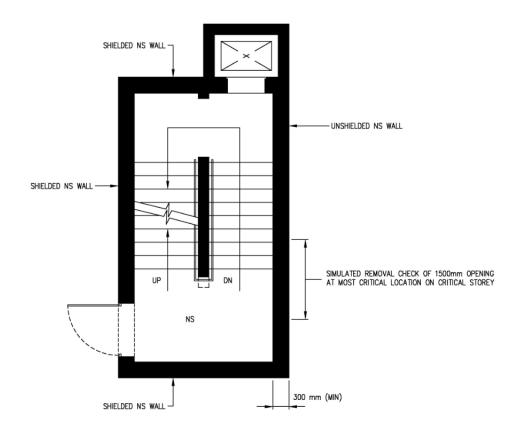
D : UNSHIELDED NS WALL OF S/C SS TOWER
